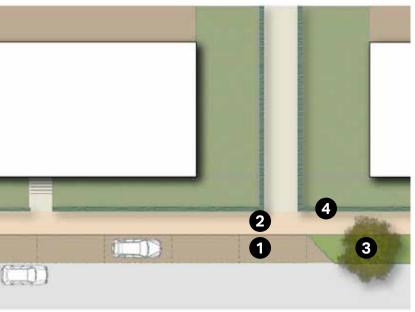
Illustrative diagram showing an indicative layout of on-street inset parking.
